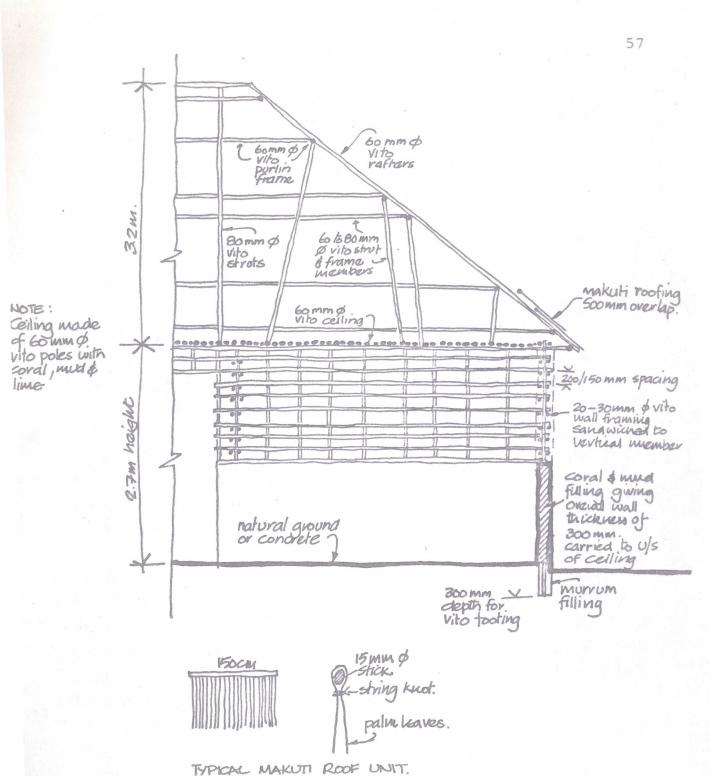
TYPICAL COAST (DIGO) CONSTRUCTION
